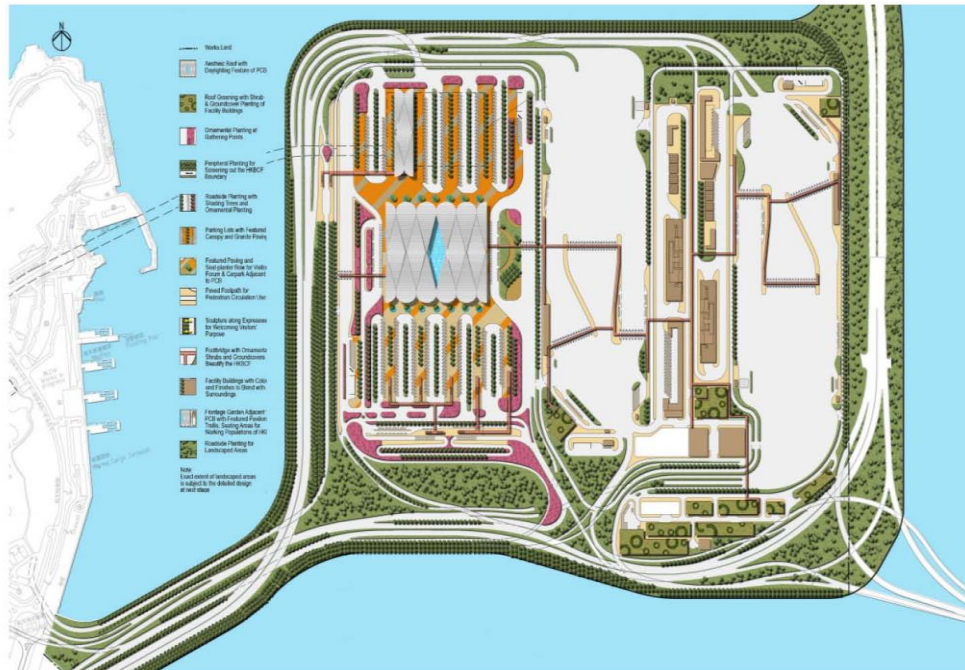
Layout plan of Hong Kong Boundary Crossing Facilities
